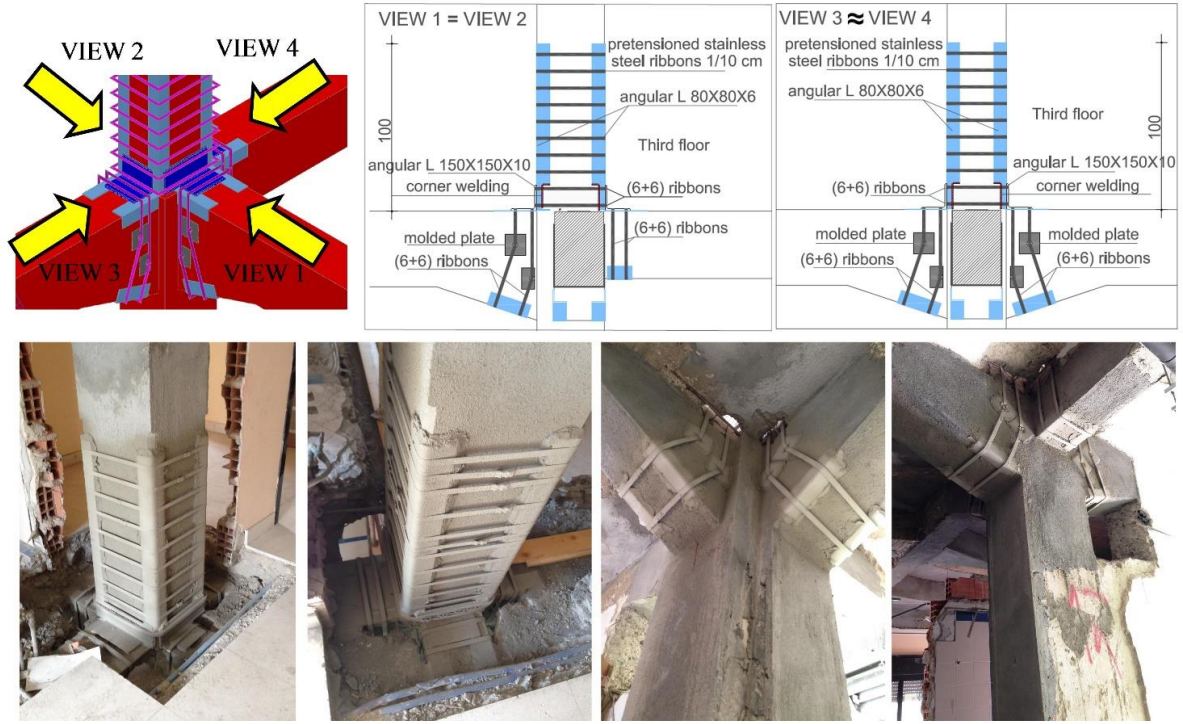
Design drawings and photographs of installation stages concerning the strengthening of the top-floor beam-column joint through pre-tensioned stainless steel ribbons
